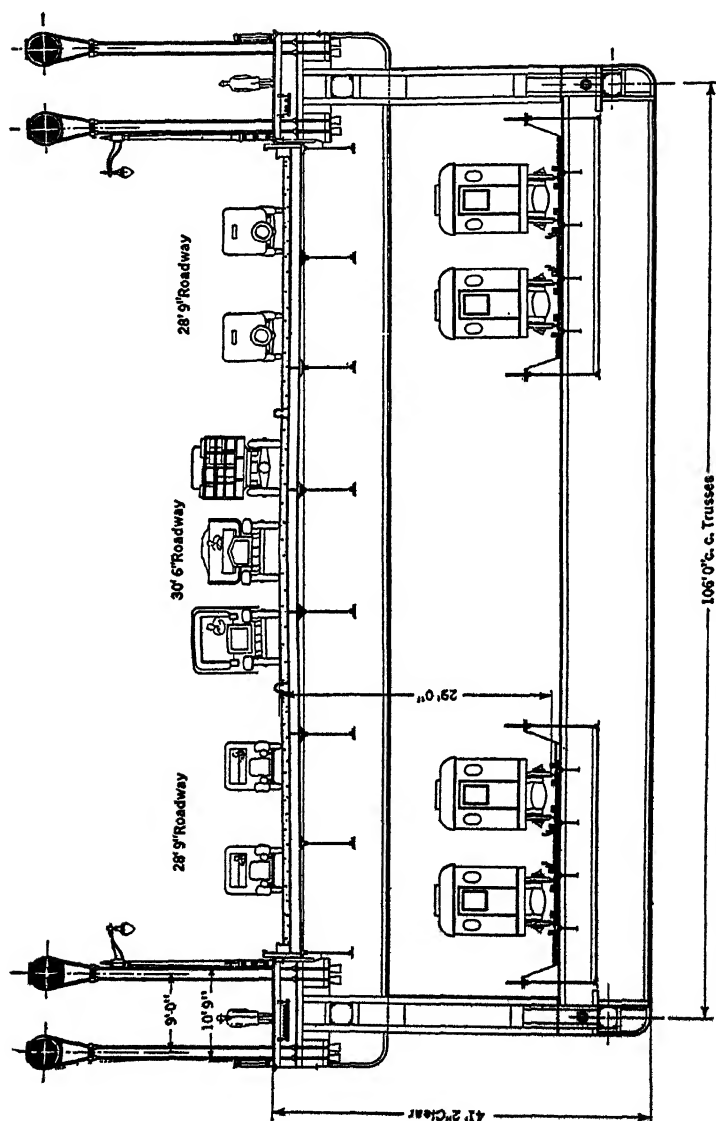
Typical Cross-Section of Double-Deck Floor, George Washington Bridge
